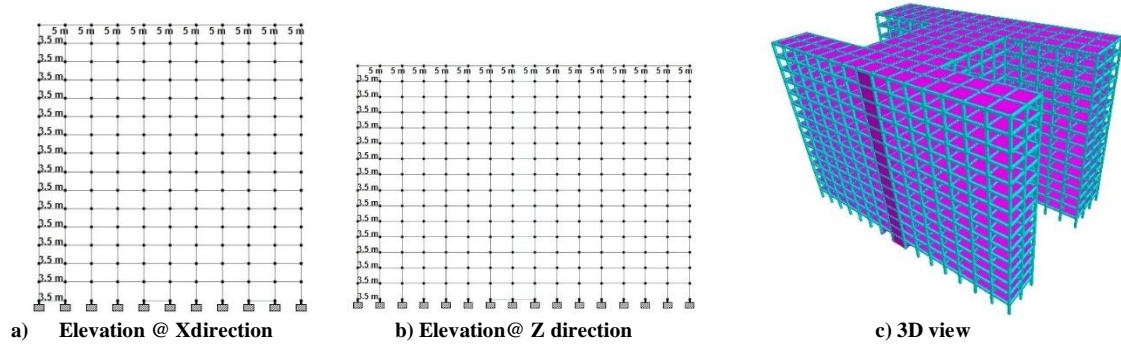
Model 5- G+14 Storey Building with H-shaped geometrical plan.
